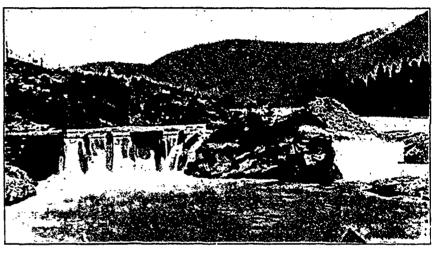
WOODEN DAM, SITUATED ABOVE CONCRETE DAM.
